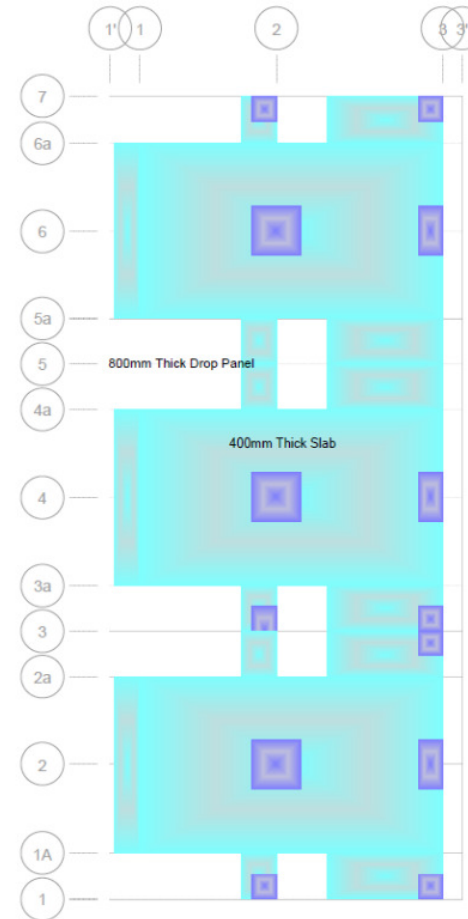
Plan layout with beam/slab section properties in design calculations
